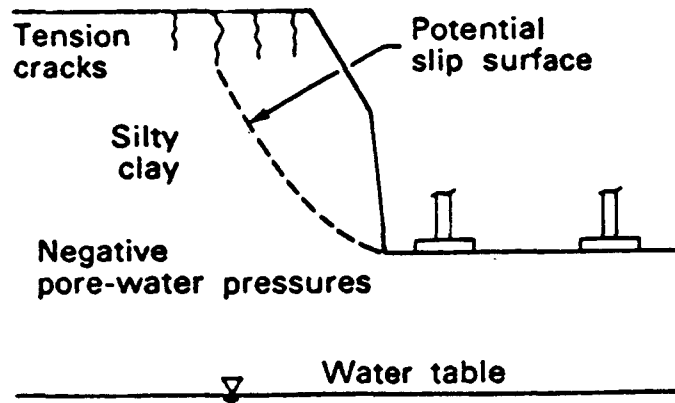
Stability of a near vertical excavation used in the construction of a foundation
